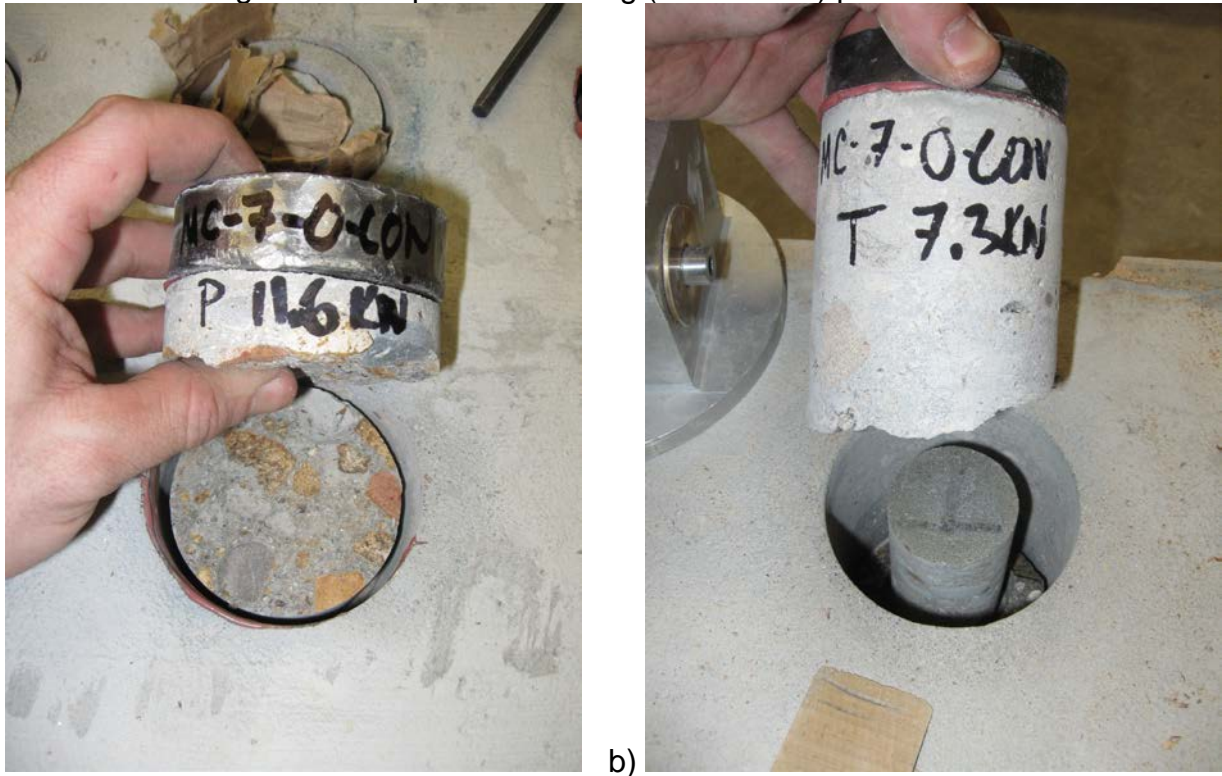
Bond test specimens after failure : a) direct tension loading; b) torque loading
